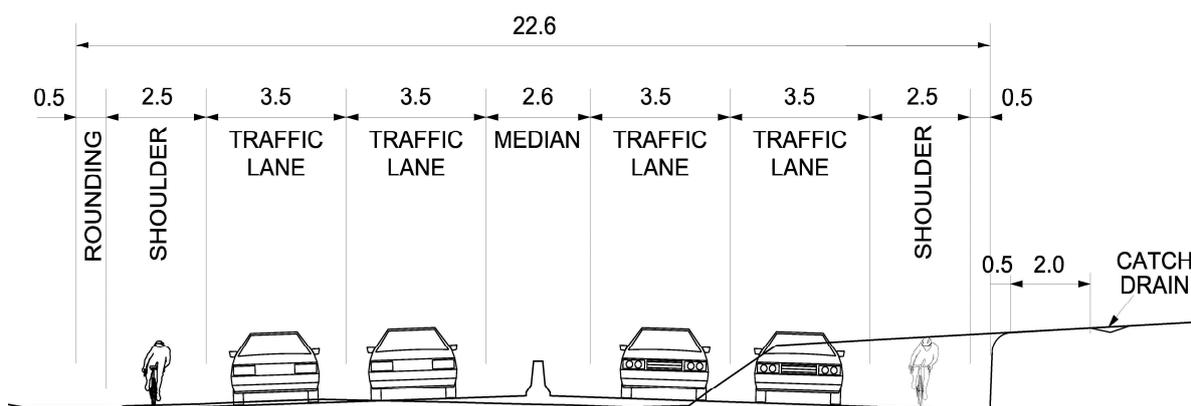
Typical cross-sections for the Mona Vale Road upgrade
